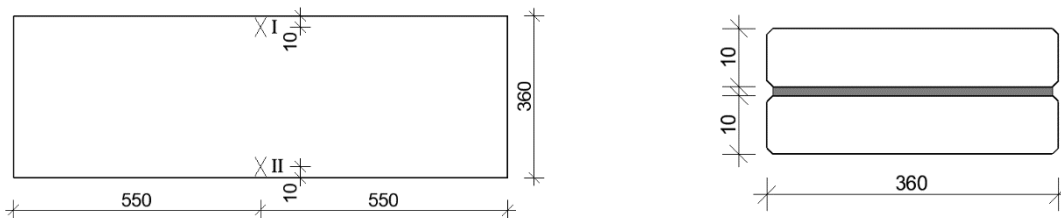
Displacement sensors position on the test specimen and laminated panel cross section
